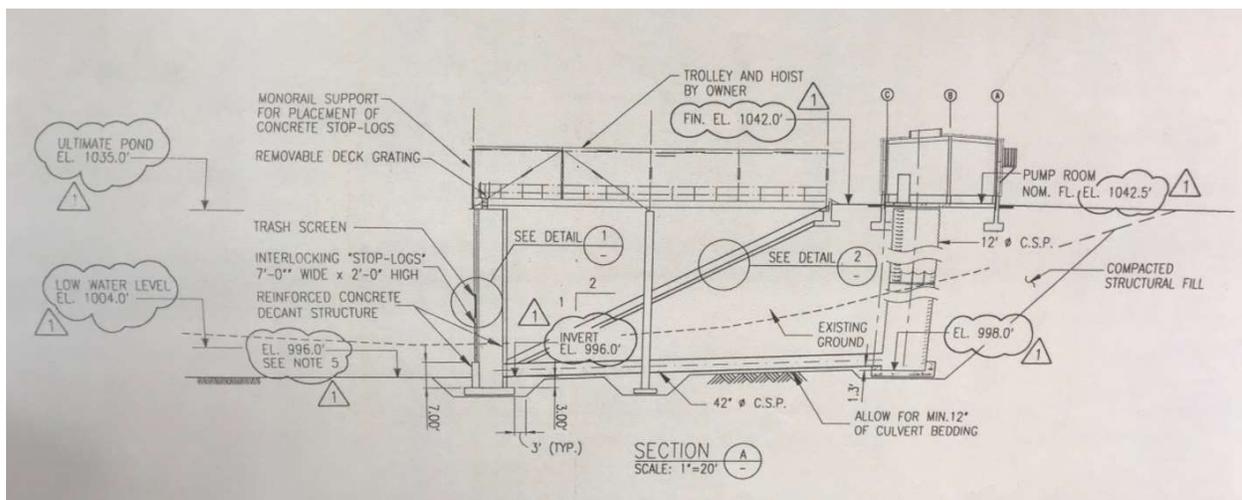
Original reclaim bottom-draw inverted intake and well (Courtesy of Newmont and Kilborn)
